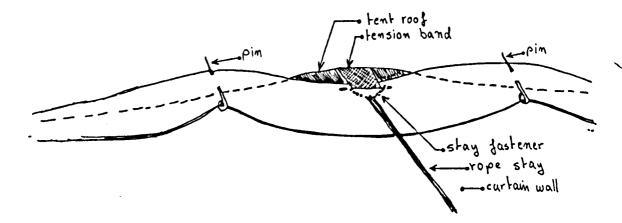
A sketch that shows the curtain walls pinned to the tent roof (7).
